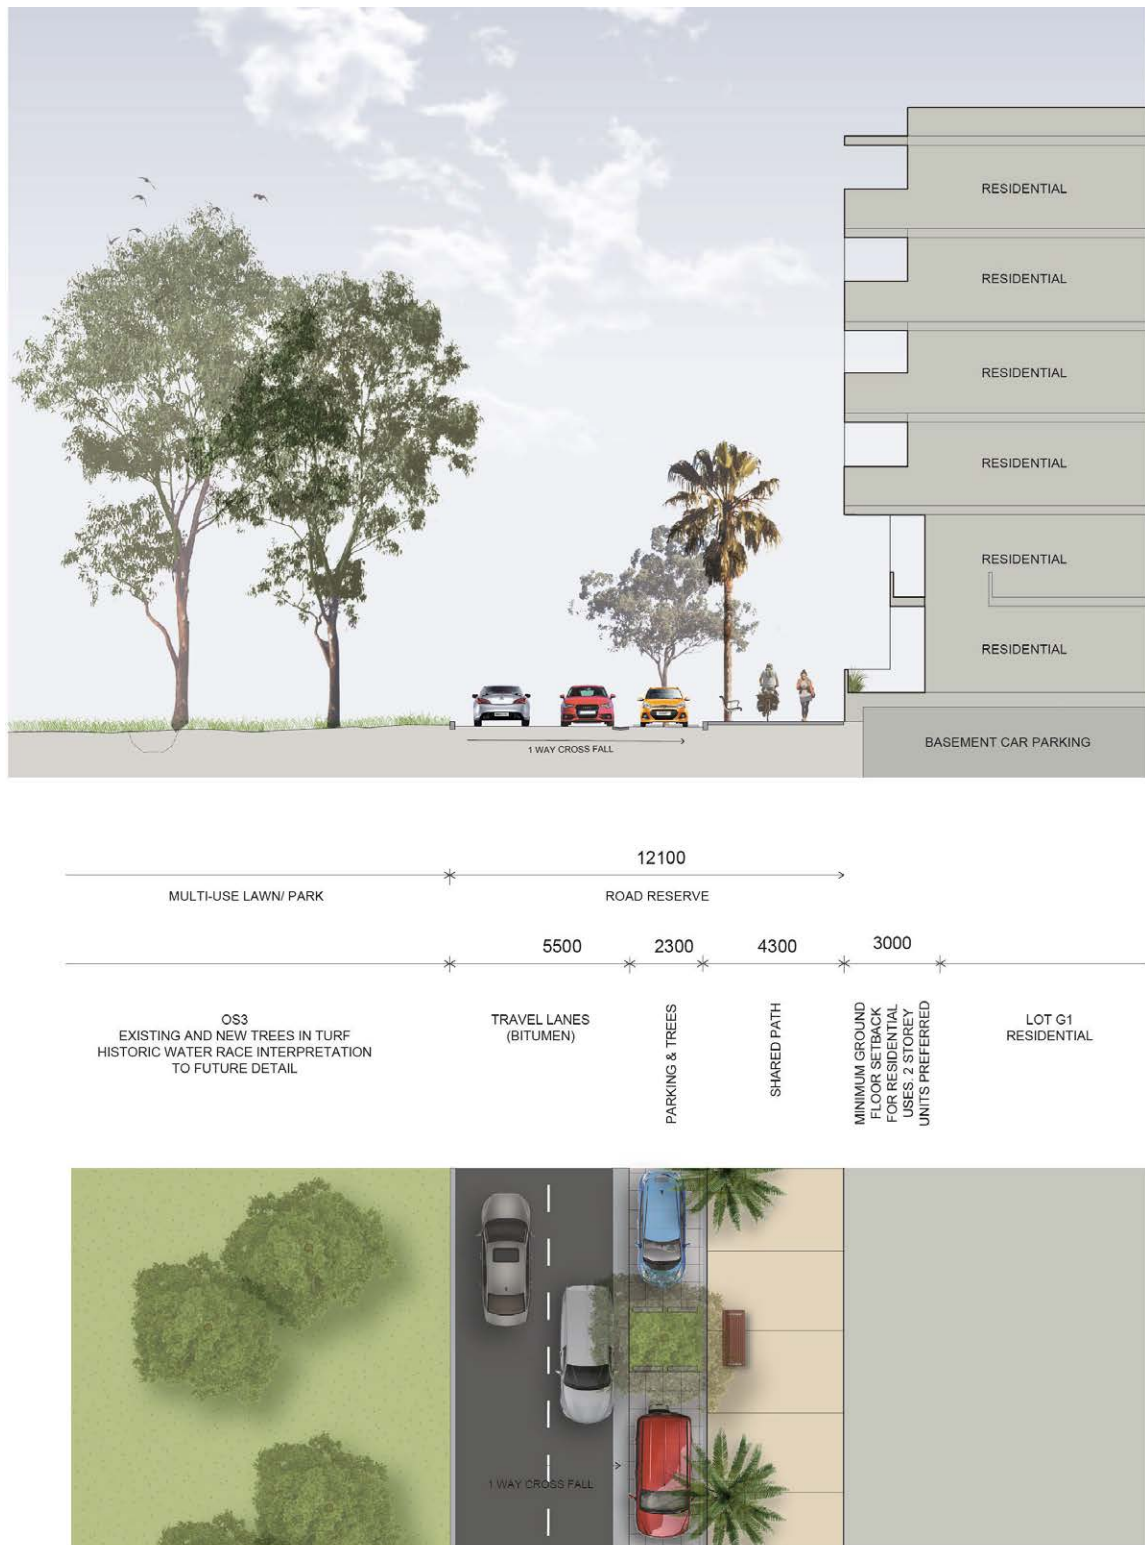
Typical street section 6 – East Circuit (east)
